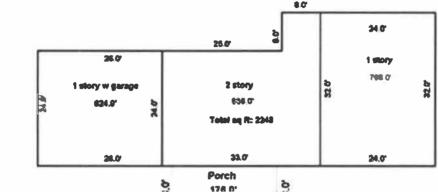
Floor plan from PVA. Please note that the total floor area indicated on the drawing is calculated including the garage but not the second story
